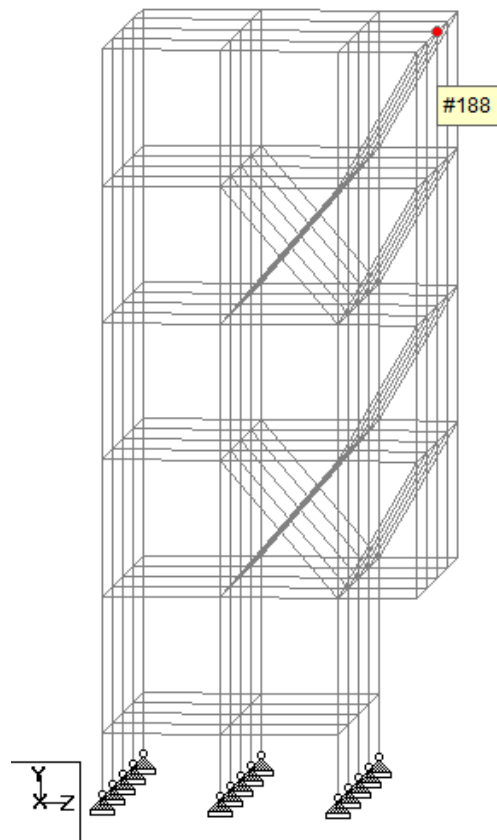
Building Model with overhanging beams with floating columns with single bracing in end bay and cross bracing in adjacent bay
